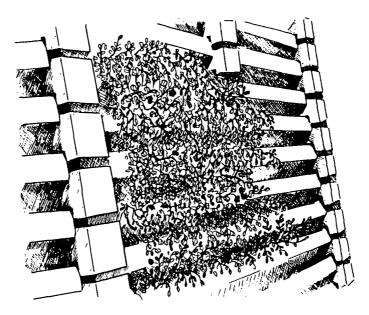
Vegetated, open-face crib wall design. Cribbing is erected "log cabin" fashion with a batter of 1:6. Suitable vegetation is planted in the open bays between structural members at the front of the crib wall. This procedure not only provides secondary reinforcement of the cribfill (via plant roots) but also opportunities for imaginative landscaping on near vertical surfaces.
